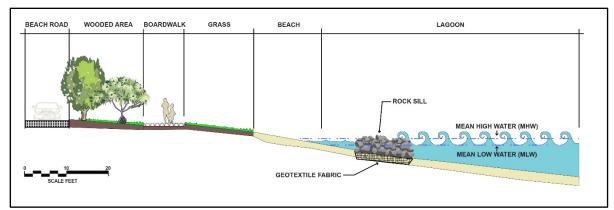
Beach profile showing the addition of a rock sill with a crest elevation at mean high water. Bedding stone and geotextile fabric reduce the potential for the rock still to scour into the existing lagoon bottom.
